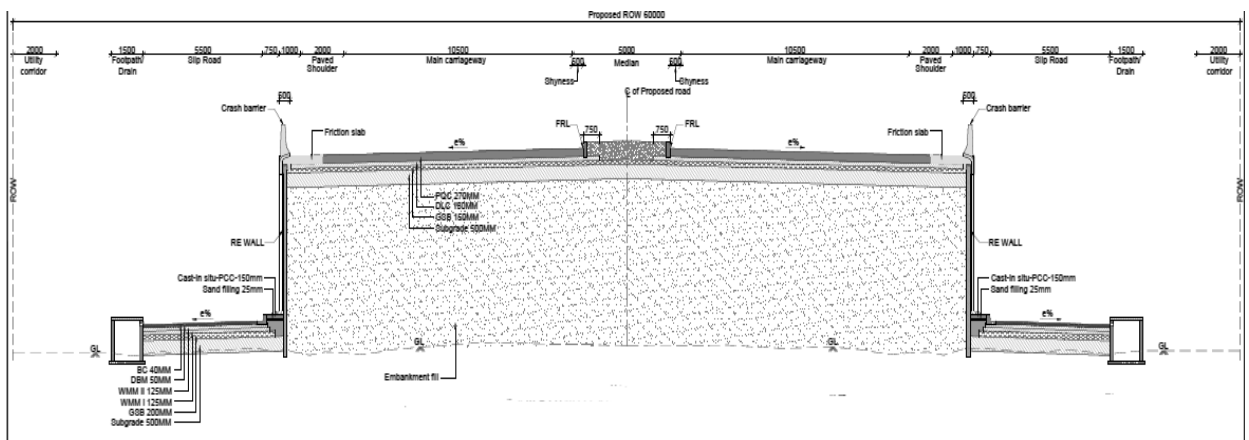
TCS-6C Typical Four Lane Underpass Cross Section With Slip Roads In Bypass & Realignment
